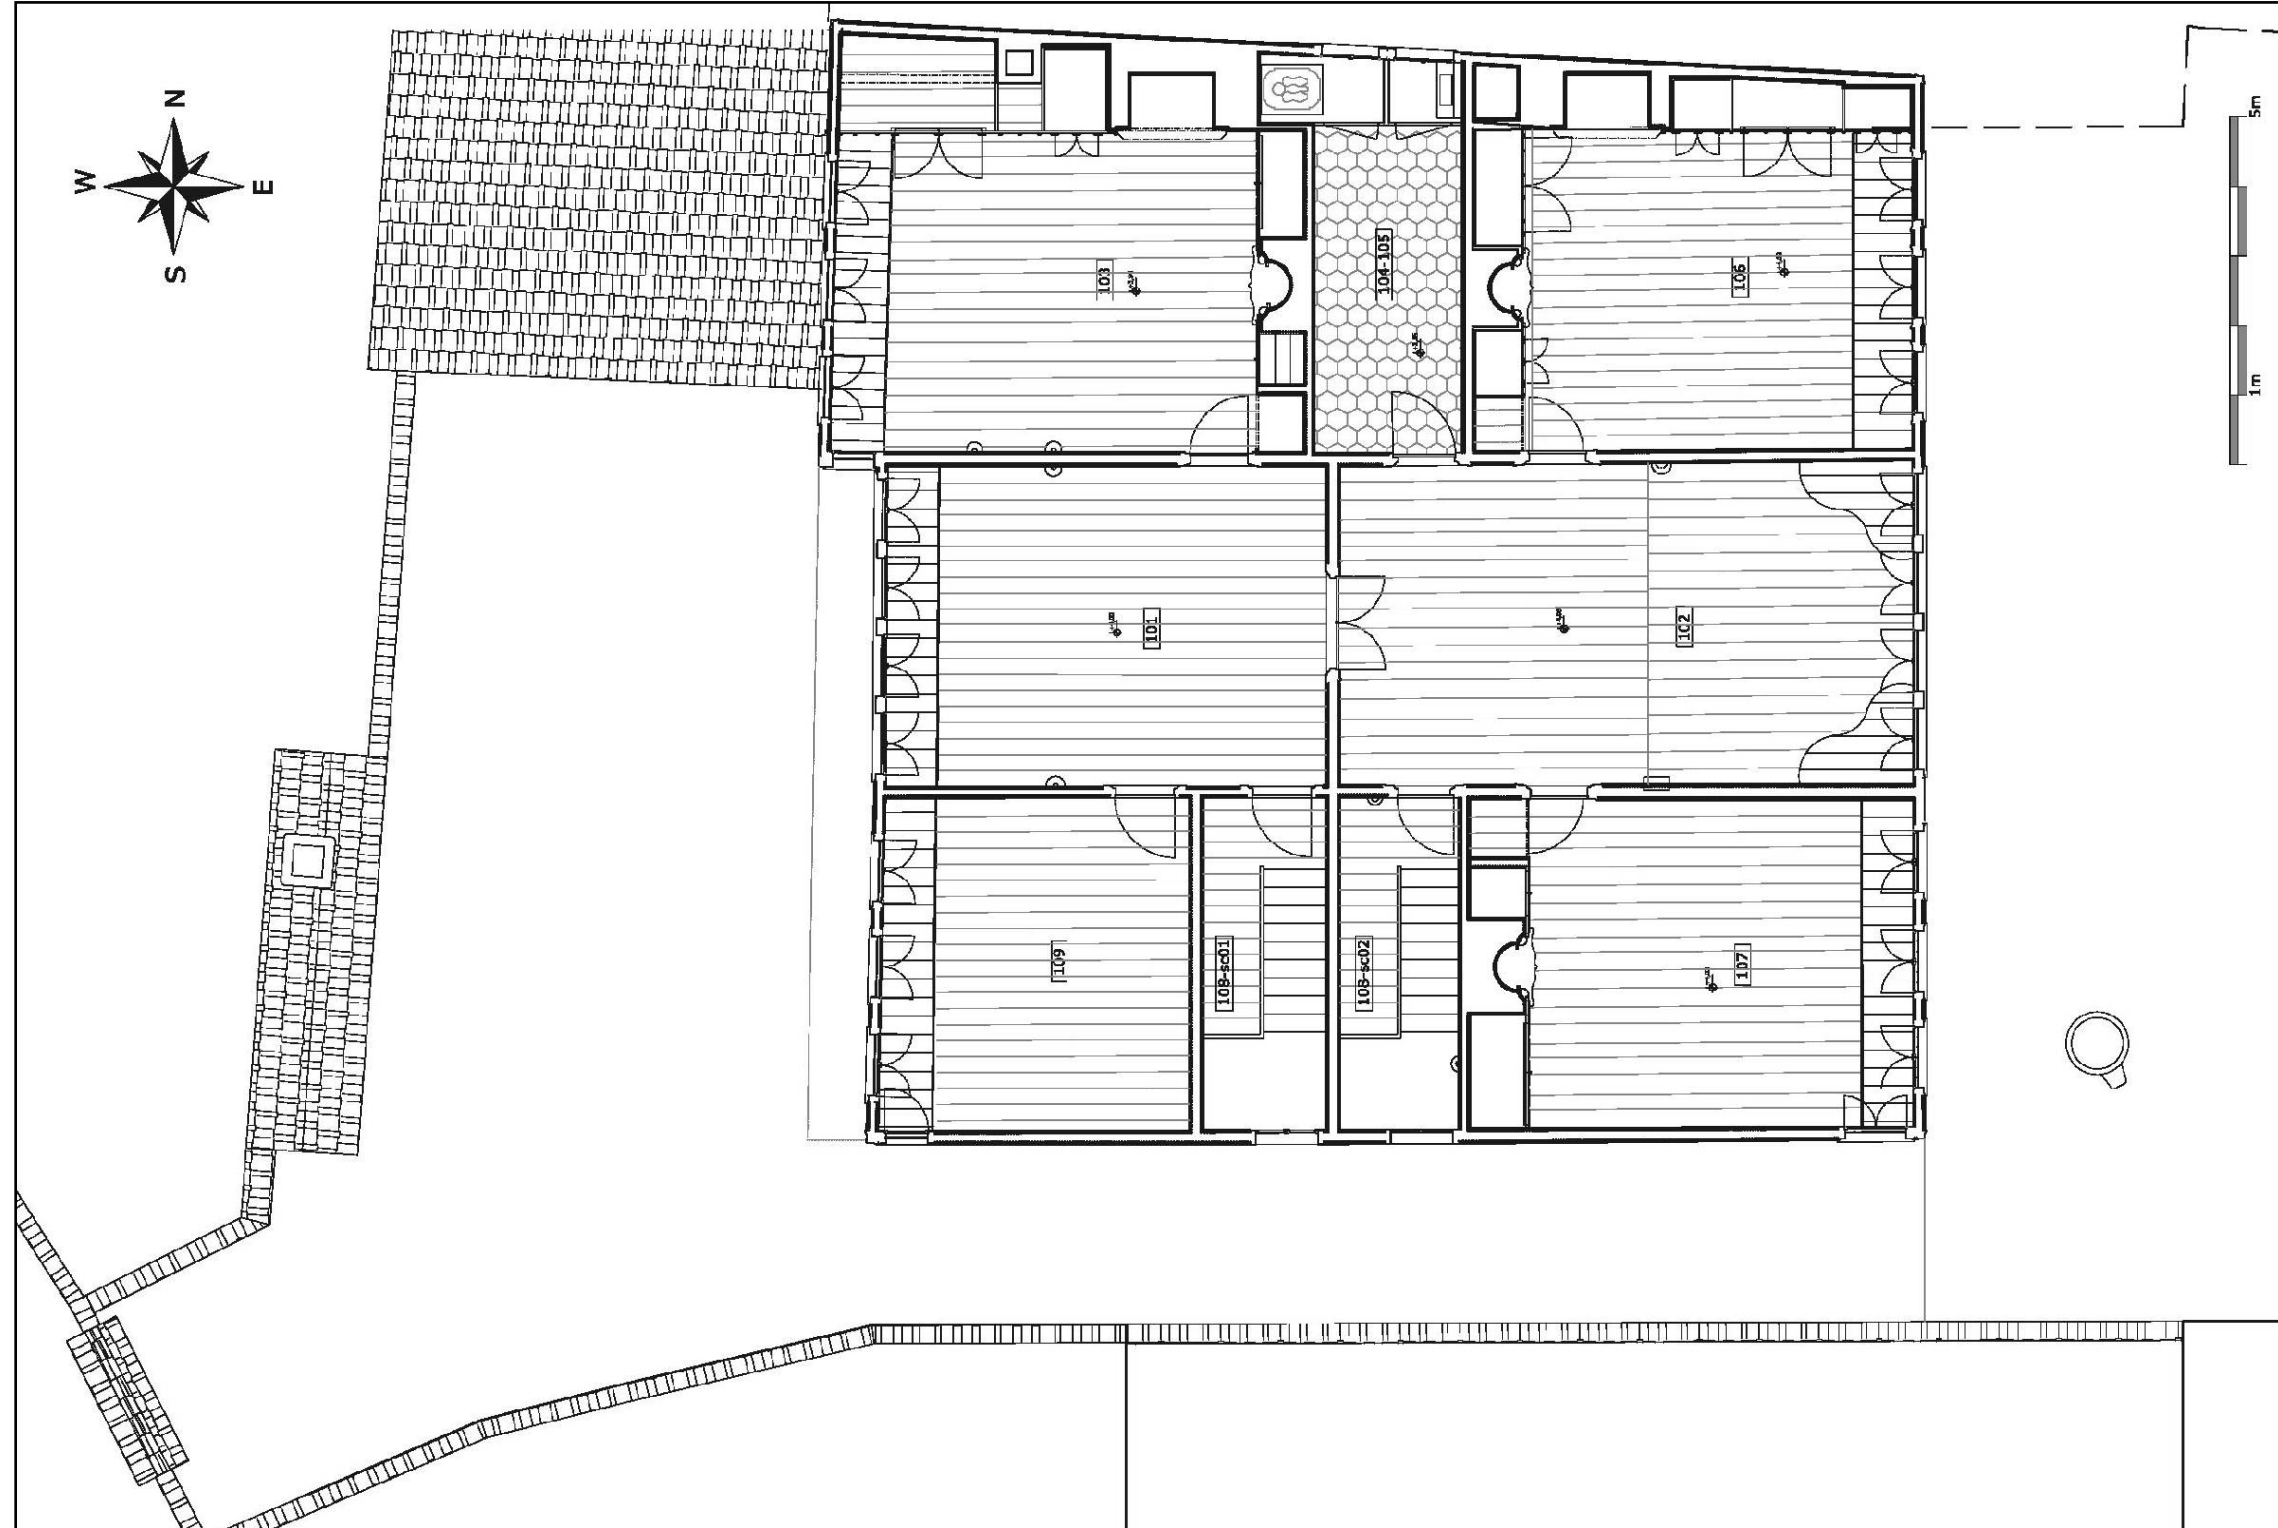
Restitution Phase I – First Floor Plan: 1/100 (Presented in 1/50 at Jury)
